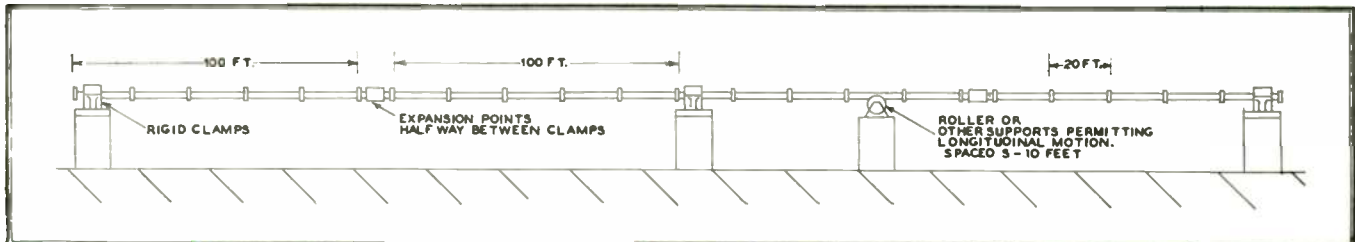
PROPOSED CONSTRUCTION FOR A LONG LINE COMBINES RIGID AND ROLLER MOUNTS, AND EXPANSION JOINTS
